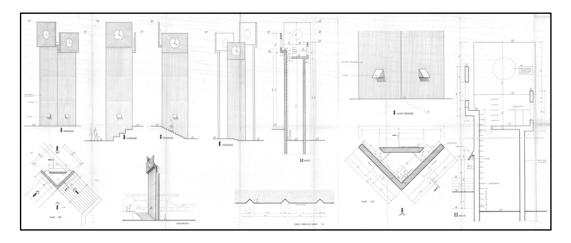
Clock tower on project Source: METU Directorate of Construction & Technical Works
